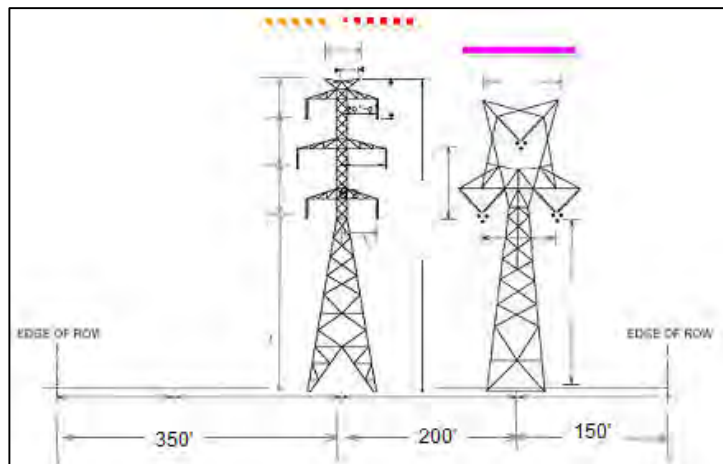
EMF cut at Slatt Substation Joint Corridor ROW
